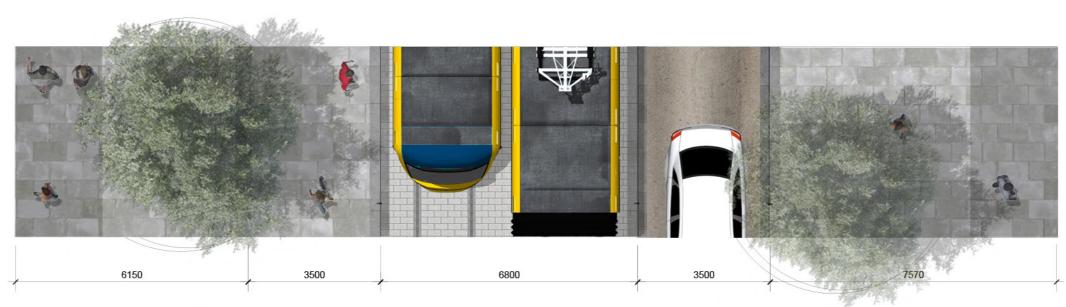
Cross section of Queen Street between Mayoral Drive (south) and Airedale Street (north) looking north towards Aotea Square. Centrally located LRV carriageway with adjacent south band traffic lane running between Wakefield Street and Mayoral Drive.
